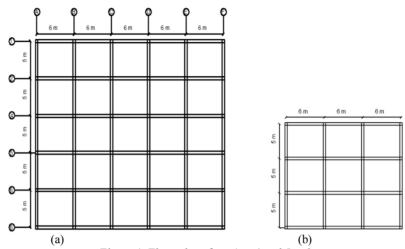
Floor plans from 1 to 4 and 5 to 8.
